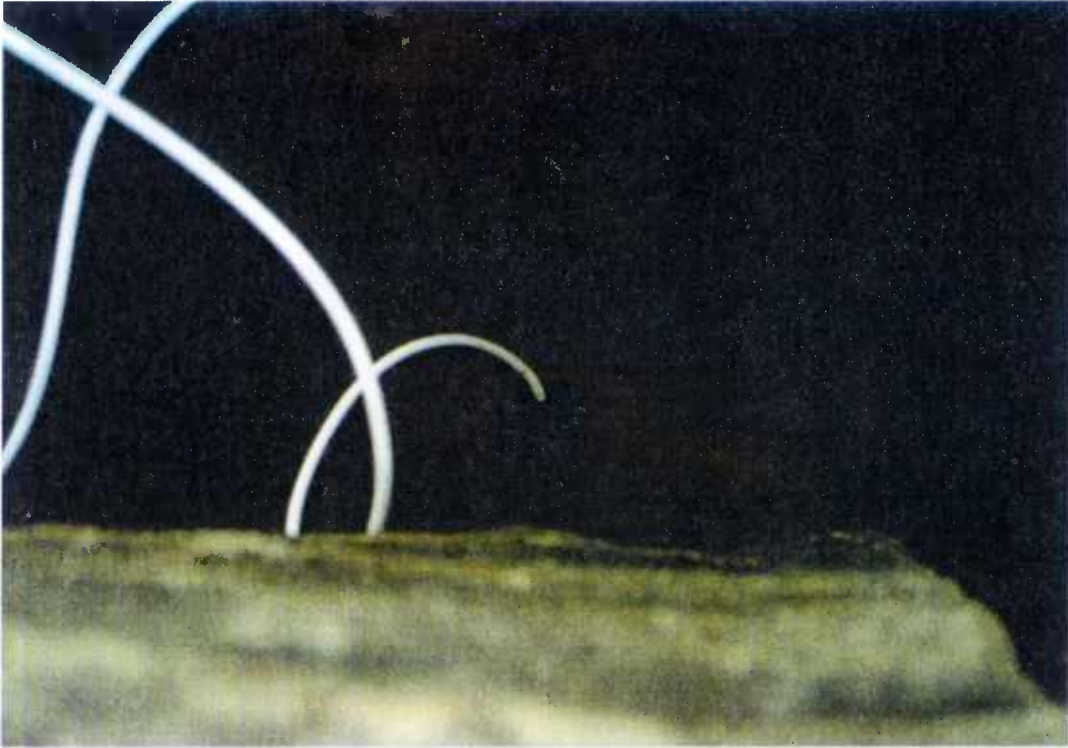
Installed flexure gauge tackwelded to the sheet pile structure
